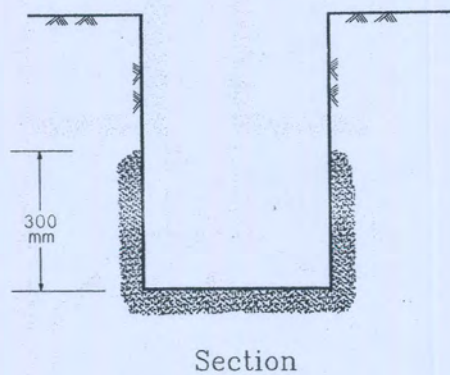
Treatment of Trench Bottom and Sides (Suggestive Typical)
